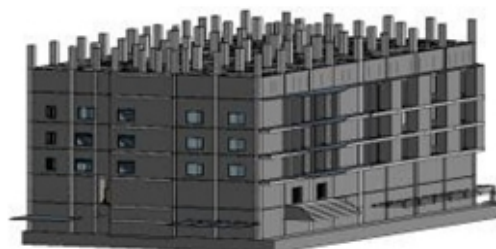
6th floor level and slab, 3rd FL wall and floor and
